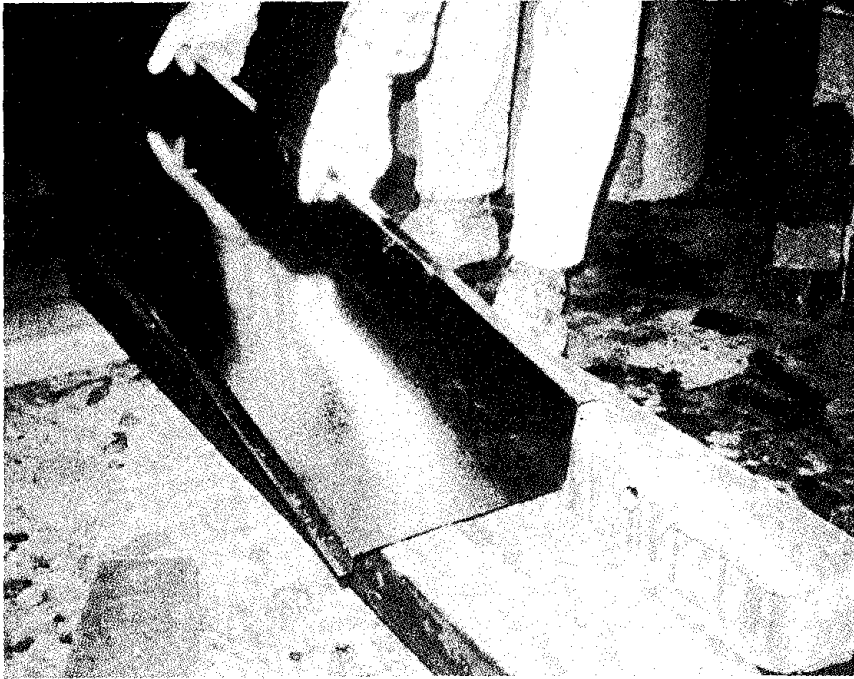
FLASHING FULLY EMBEDDED IN MORTAR
